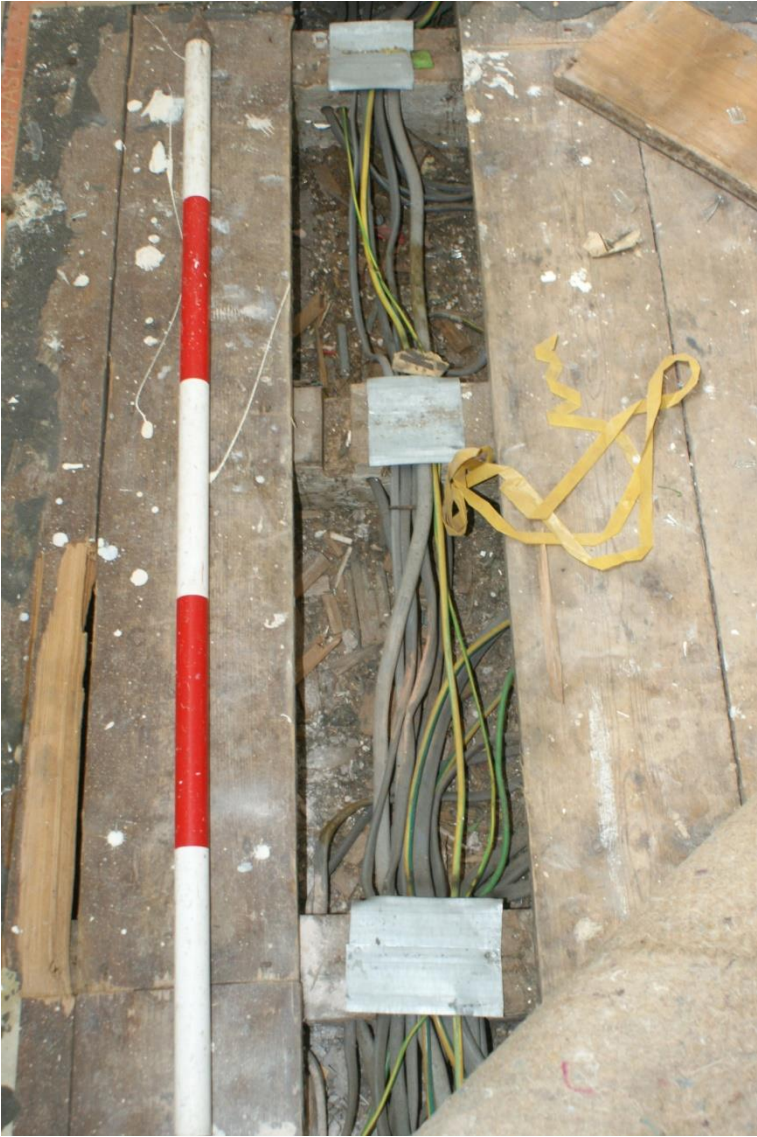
Floor joists of phase1 building, looking west, scale 1m
